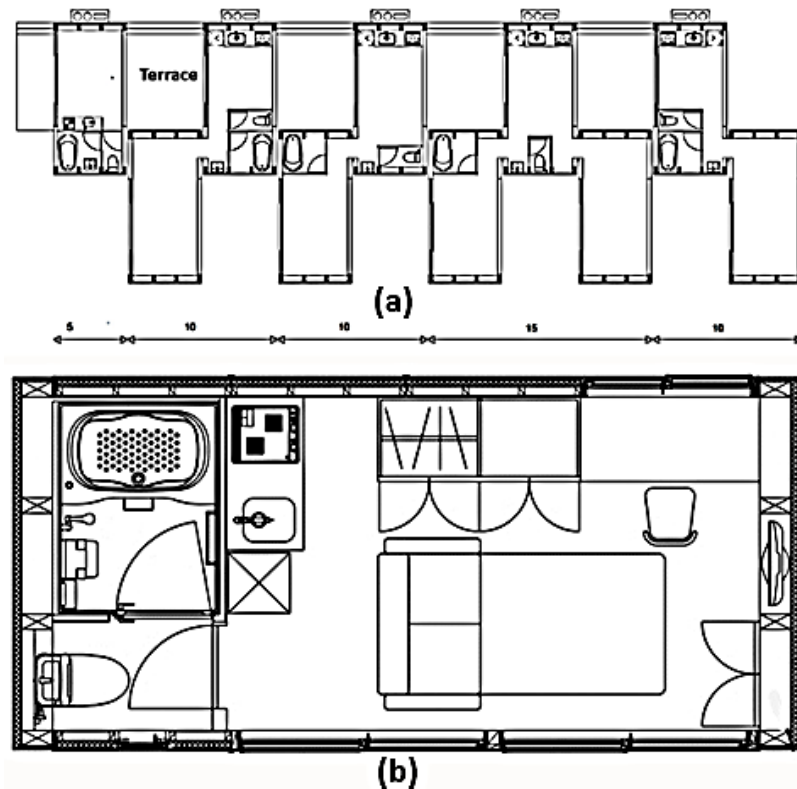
Aero house plans: (a) Basic plan for family households 10 to 5 in an Aero House (Aero House, 2011). (b) Prototype plan of an Aero House (Aero House, 2011).
